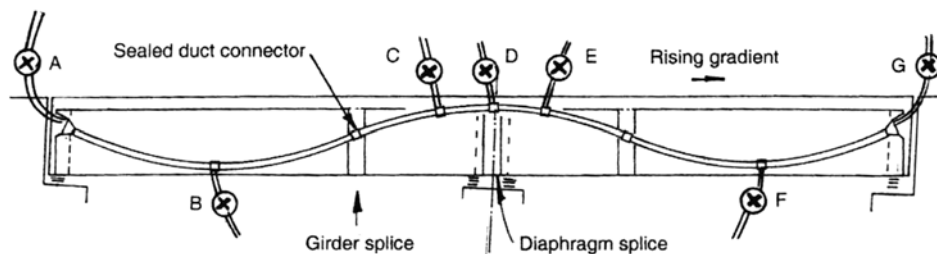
Minimum reported locations for grout inlets and outlets.
